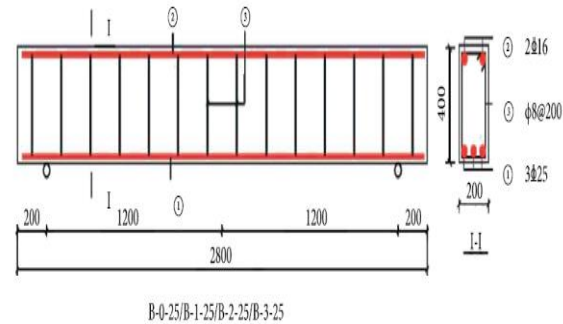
Dimensions and Reinforcement layout of RC and SFRC beam
